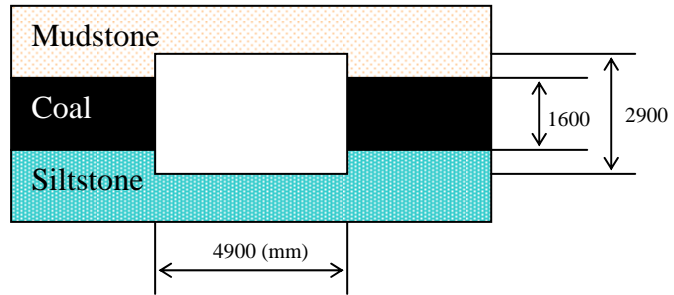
The M/G roadway section profile of T08s longwall district, Maltby colliery
